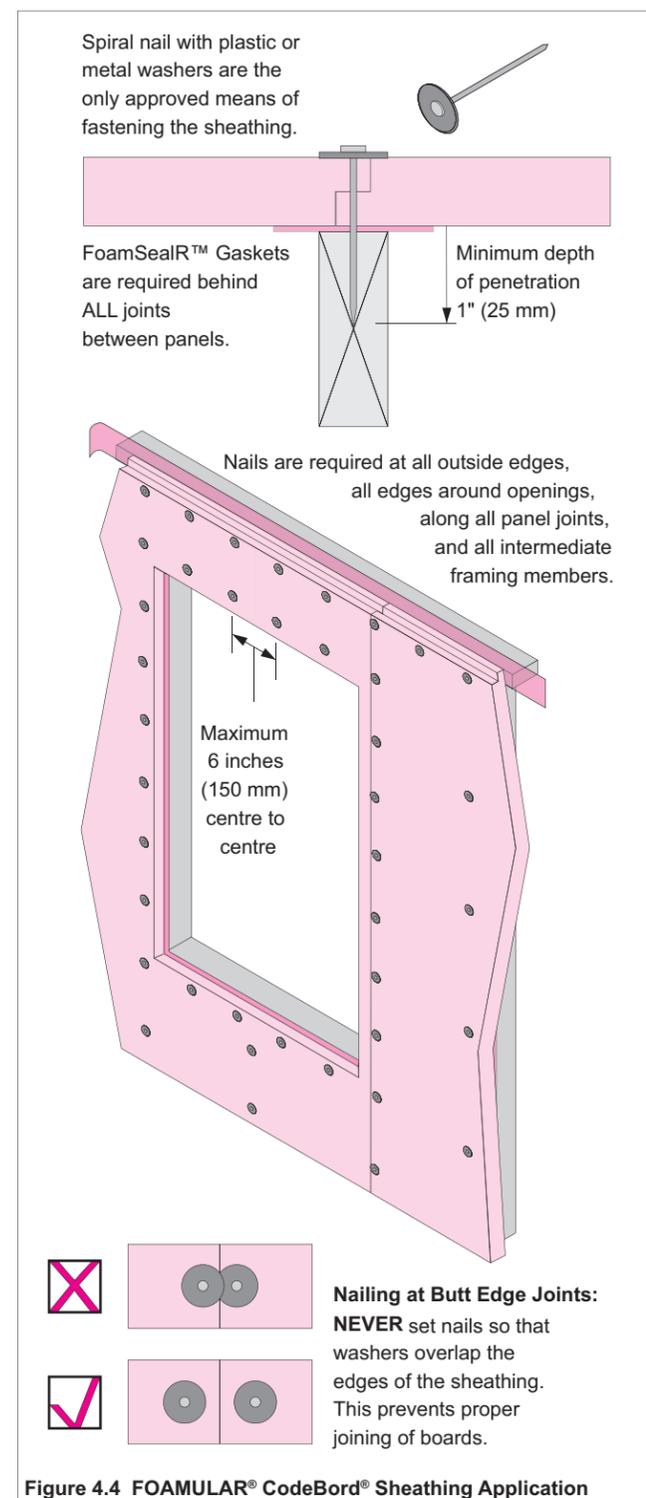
FOAMULAR® CodeBord® Sheathing Application
